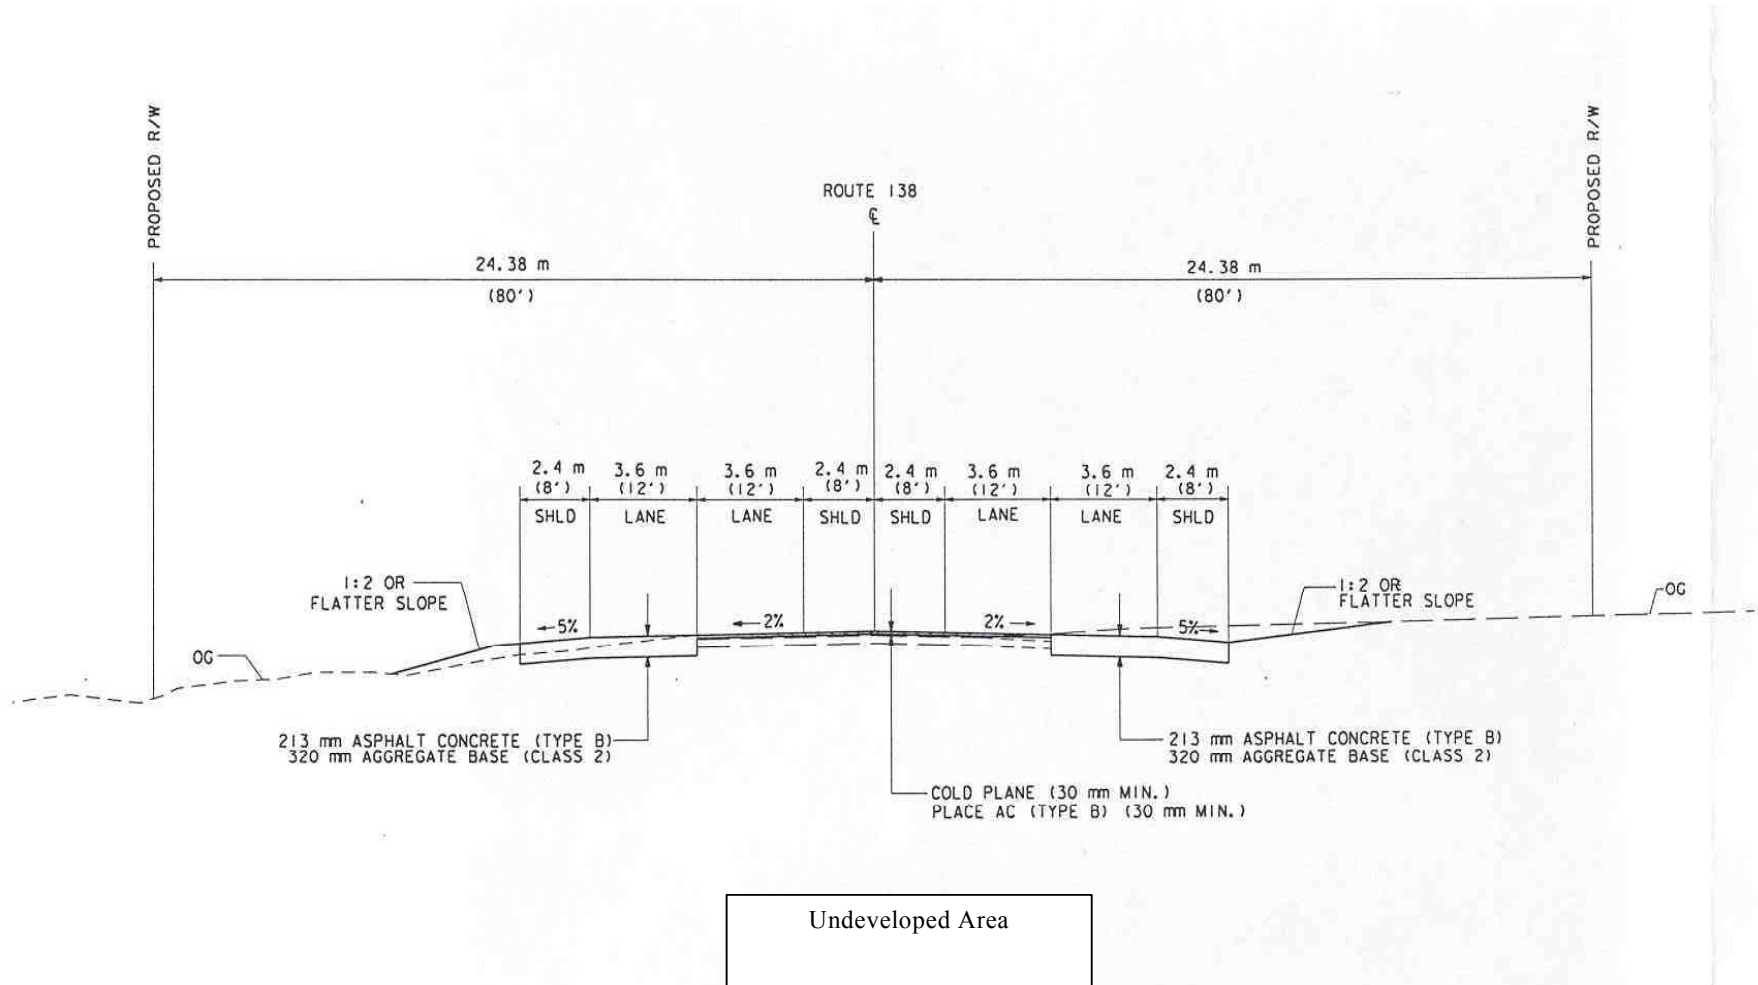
TYPICAL CROSS SECTION FOR UNDEVELOPED AREA
